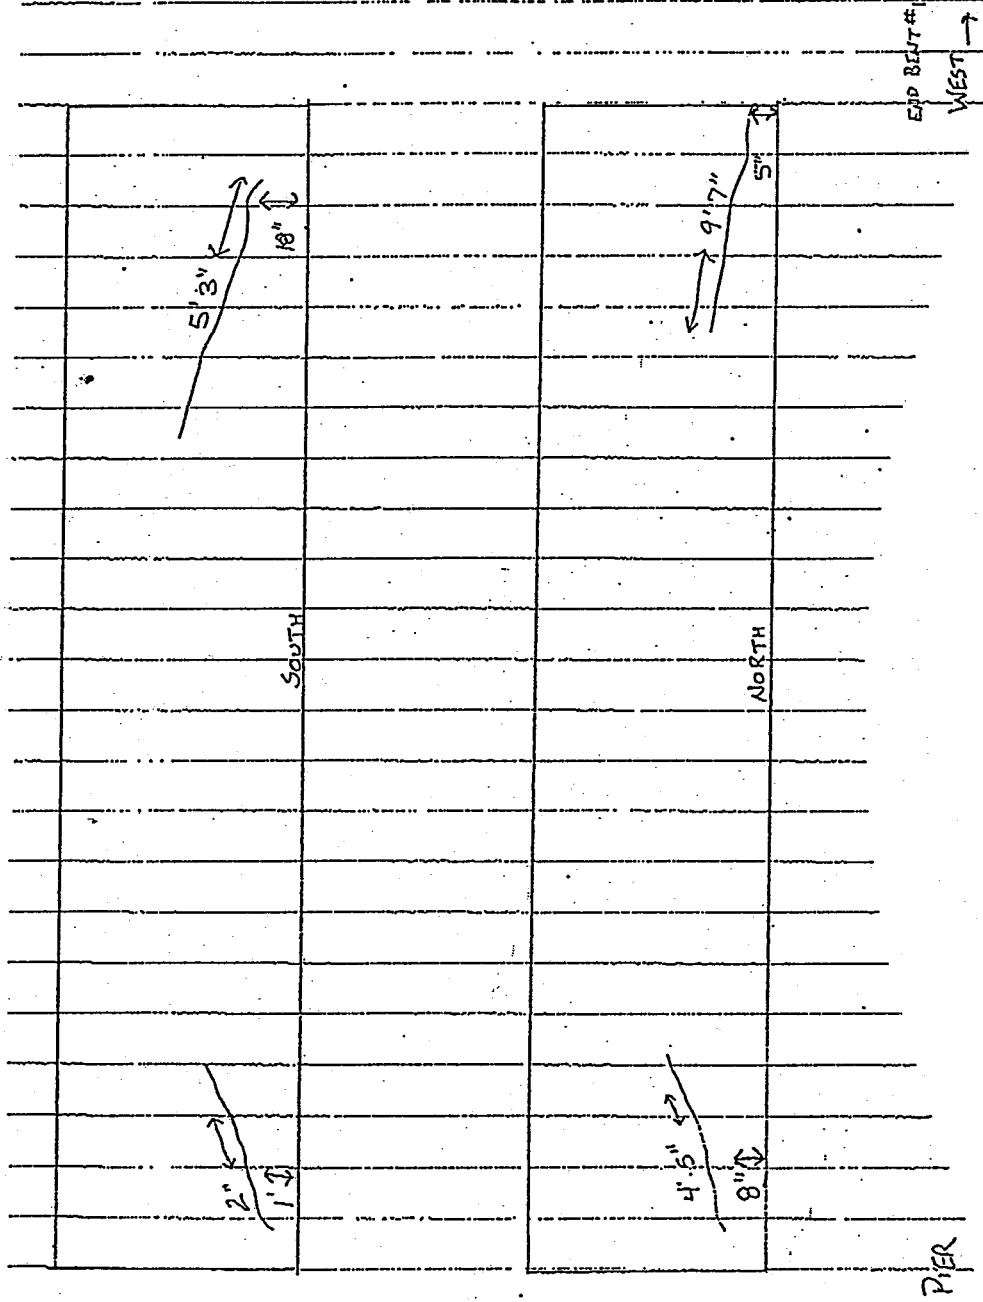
Crack of North Interior Girder over I-75 SB
